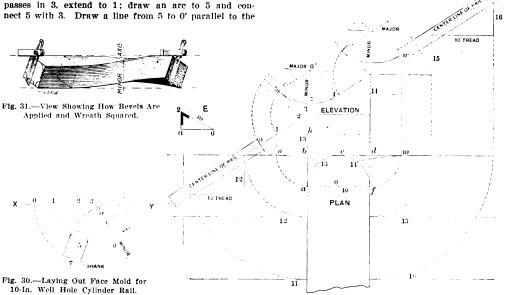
Plan, Elevation and Development of Tangents and Center Line of Rail for the 10-In. Cylinder of the Well Hole.
